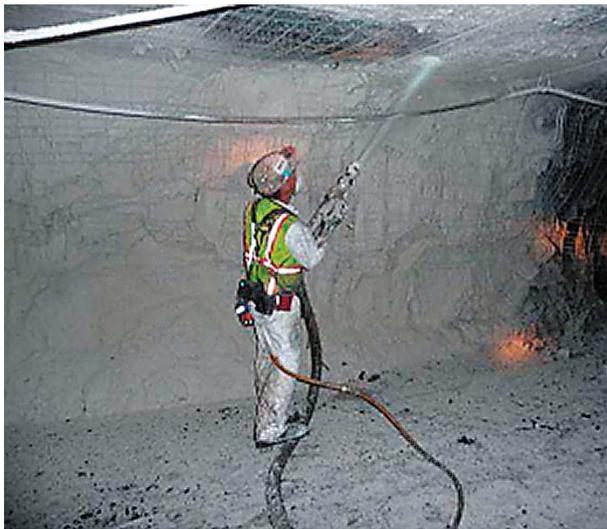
Application of a polymeric geomembrane to the surface of a mine excavation after wireline-injection hardening of the sides and roof rocks, grill installation, before RW container installation and backfilling with a paste filling
